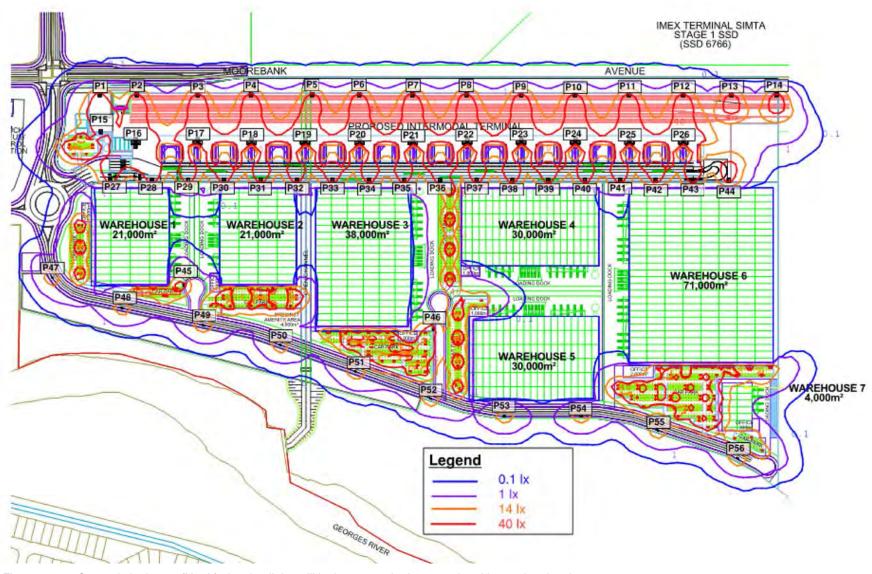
General site layout (North) showing light spill isolux curves both external and internal to the site
